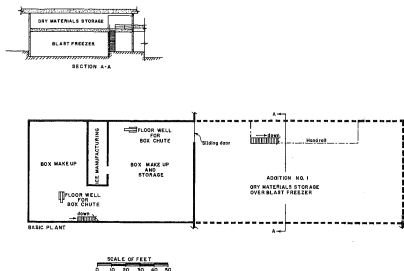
Second floor layout and section view of part of basic plant and additions.
